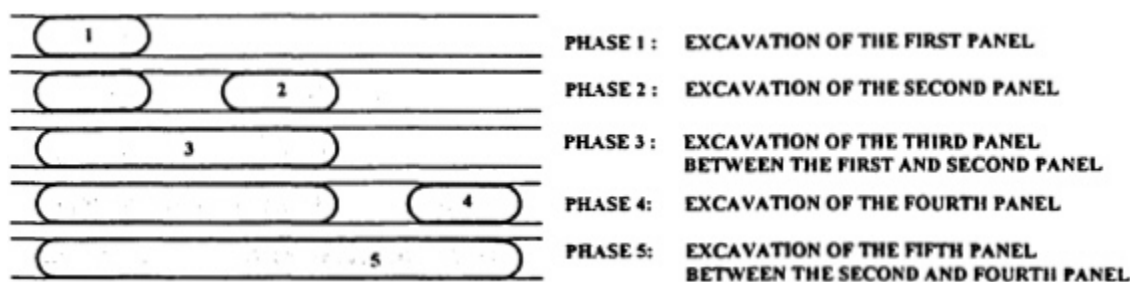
Typical excavation sequence of a cutoff wall constructed with self-hardening slurry.
